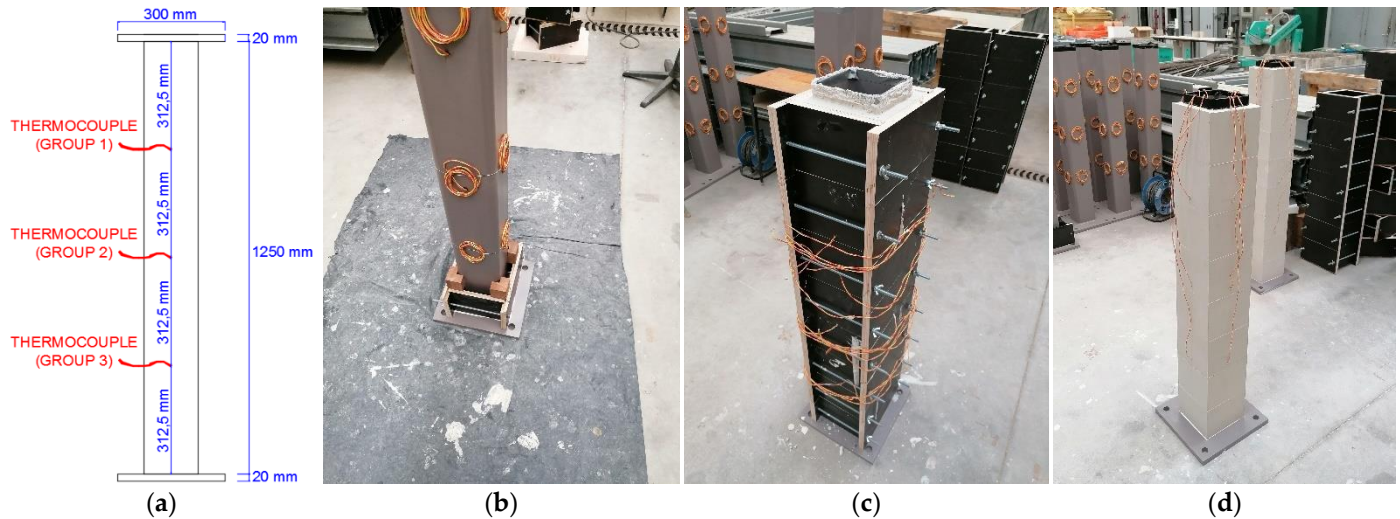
Distribution of thermocouples (a) and fabrication of specimens, preconcreting (b), concreting on the short steel columns (c), and concrete specimen without formwork (d).
